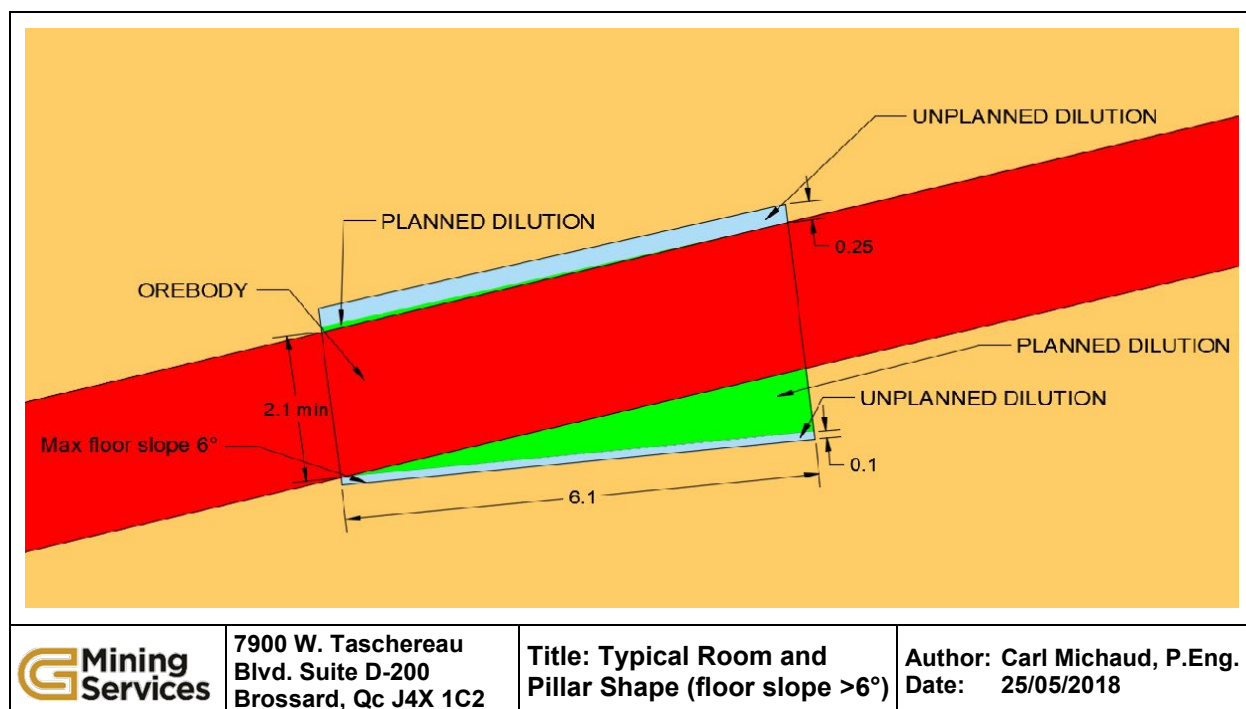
Typical Room and Pillar Shape (floor slope >6°)
